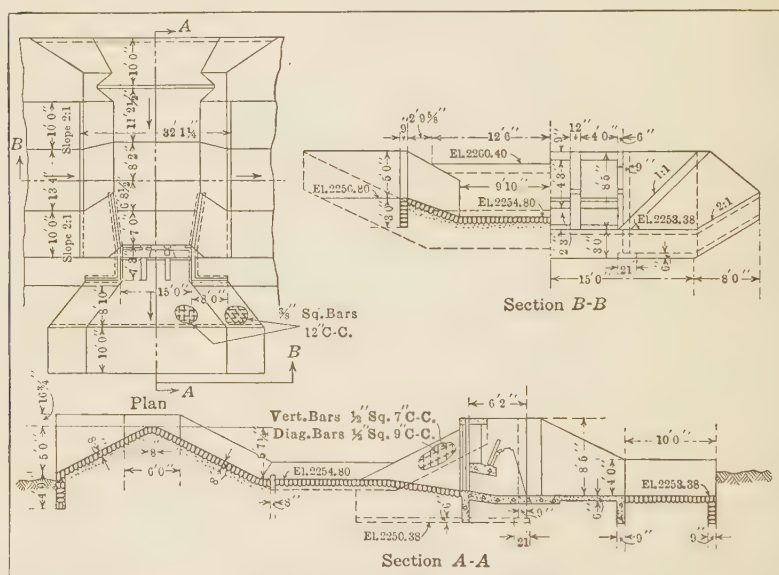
Escape and automatic spillway on Dodson North Canal, Mont.
